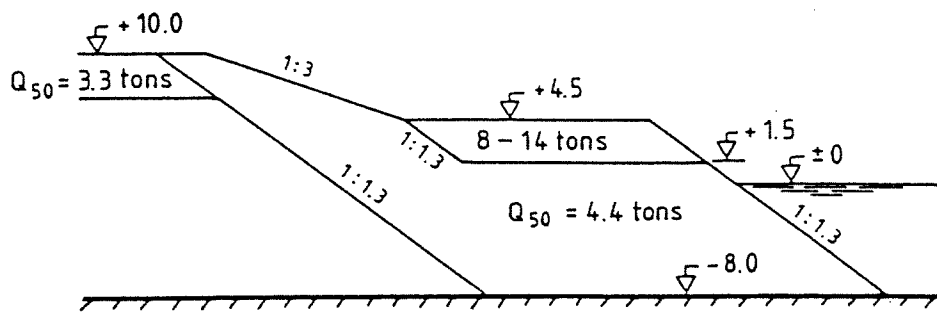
Extension of breakwater at Årviksand, profile of breakwater head. All measures are in m.
